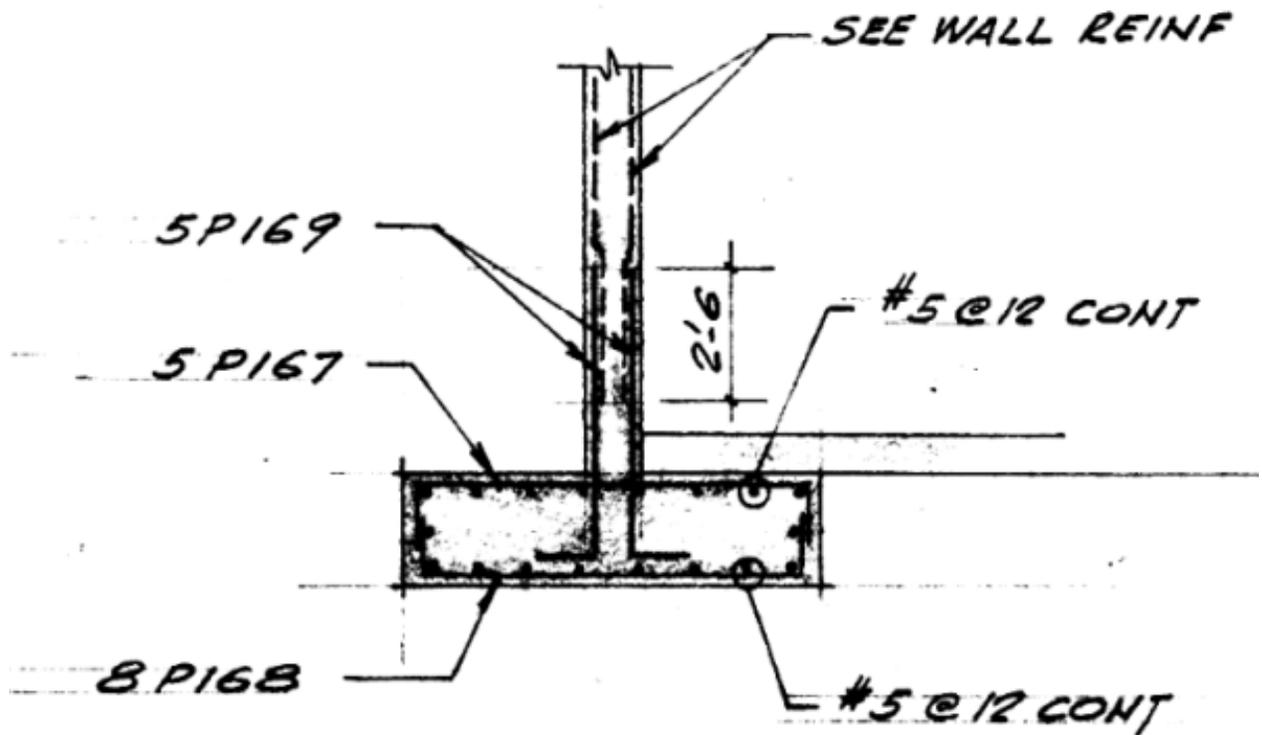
Foundation cross section and reinforcement detail (CFHT, 1974, with permission)
